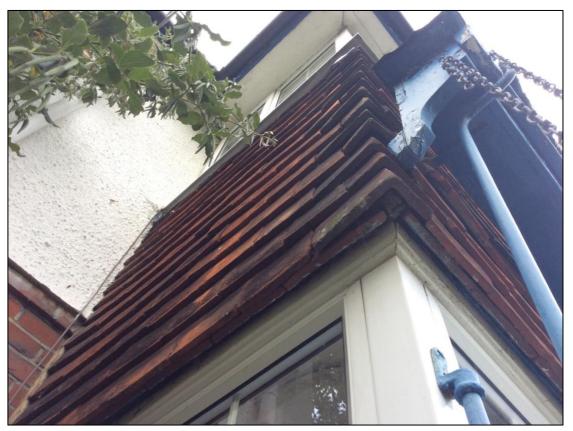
Showing an example of gaps between slipped and raised roof tiles.
